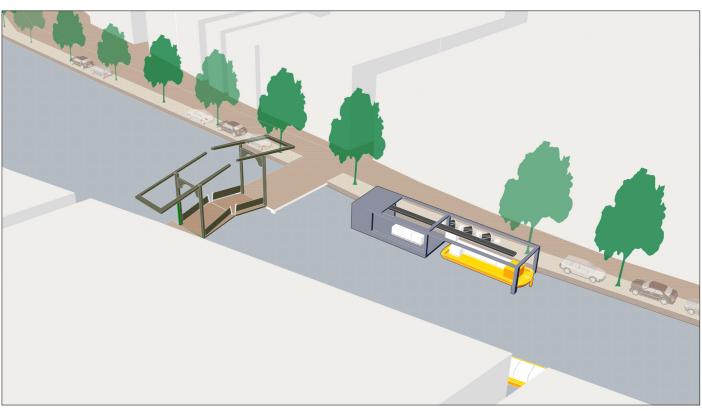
Drop-off point Taanbrug possbile design (author's drawing)
